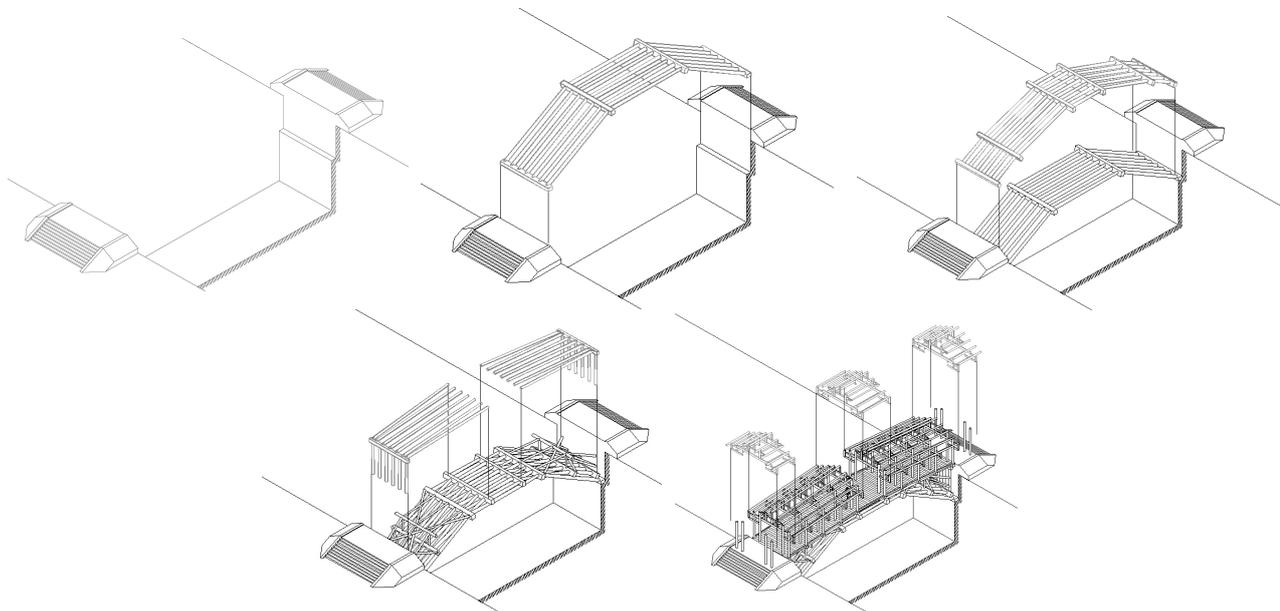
The construction process of the wooden arched bridge; (Author's drawing)
